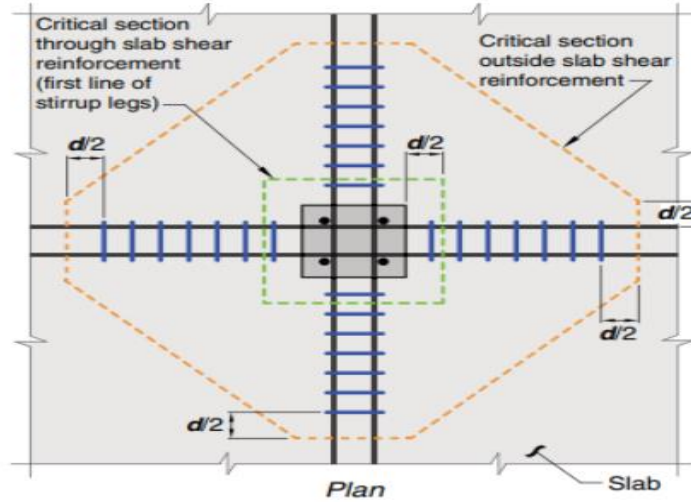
Critical Sections for Punching Shear in Slab with Shear Reinforcement According ACI Code.
